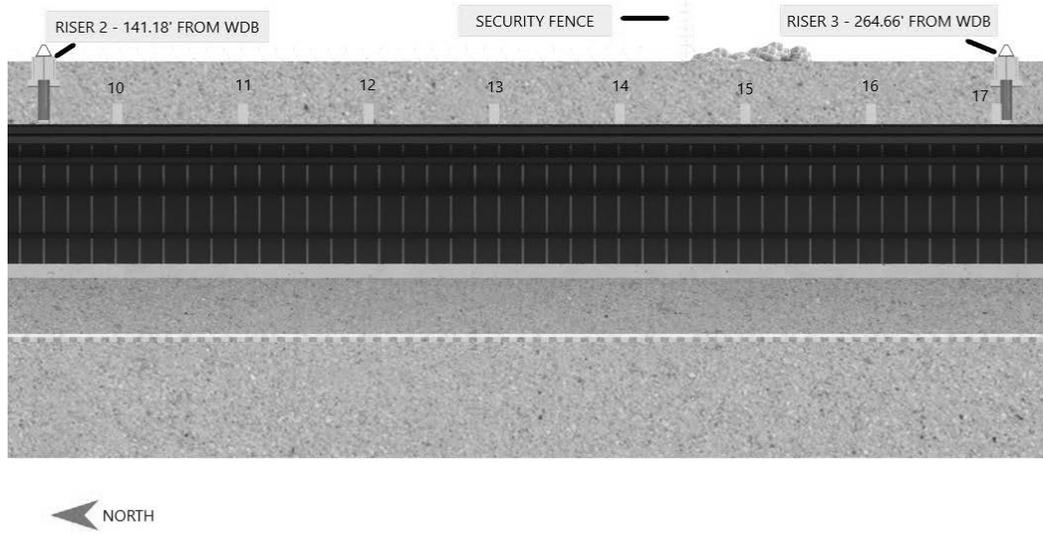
Riser 2 to Riser 3 Tunnel Section.
